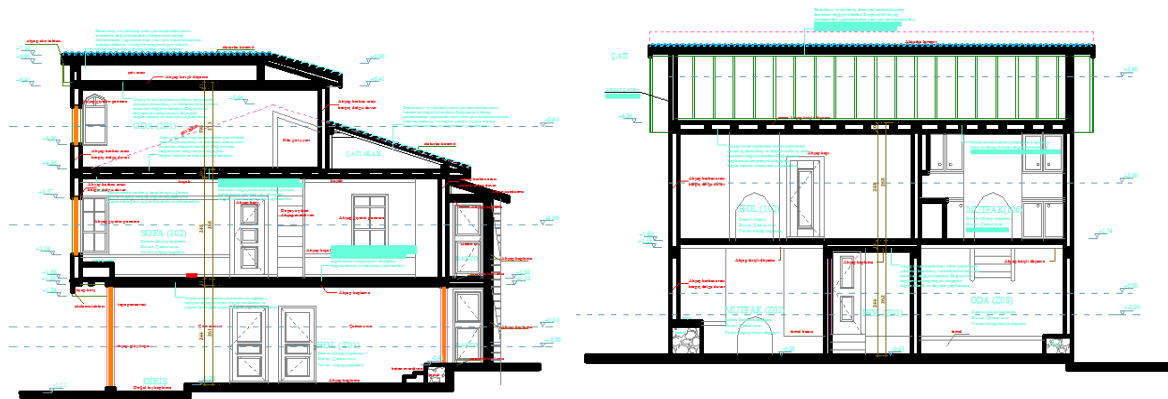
Halim Düzgün House's restoration a-a section and b-b section
